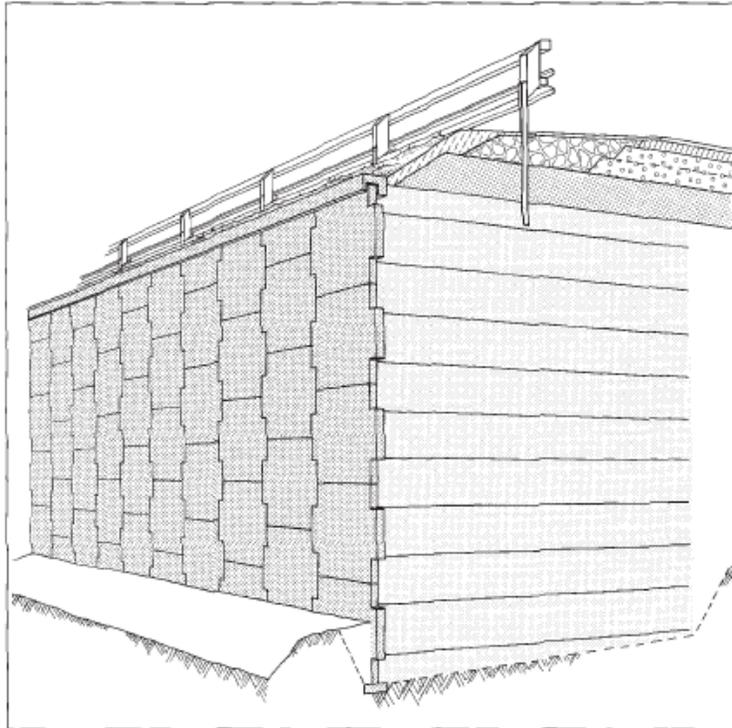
Cut-away view of a typical reinforced earth retaining wall showing strip reinforcement
